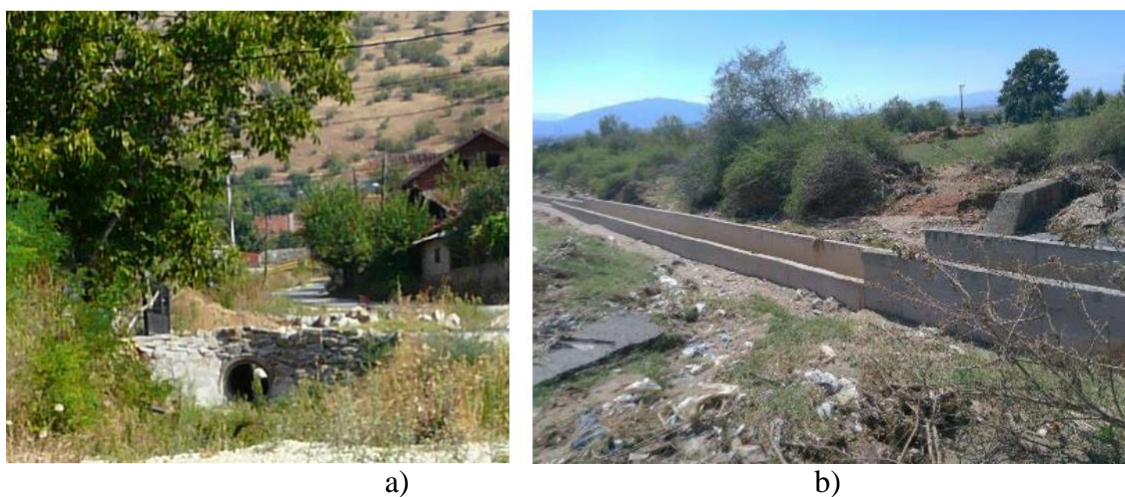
a) New designed and constructed culvert in torrent bed (2017);
